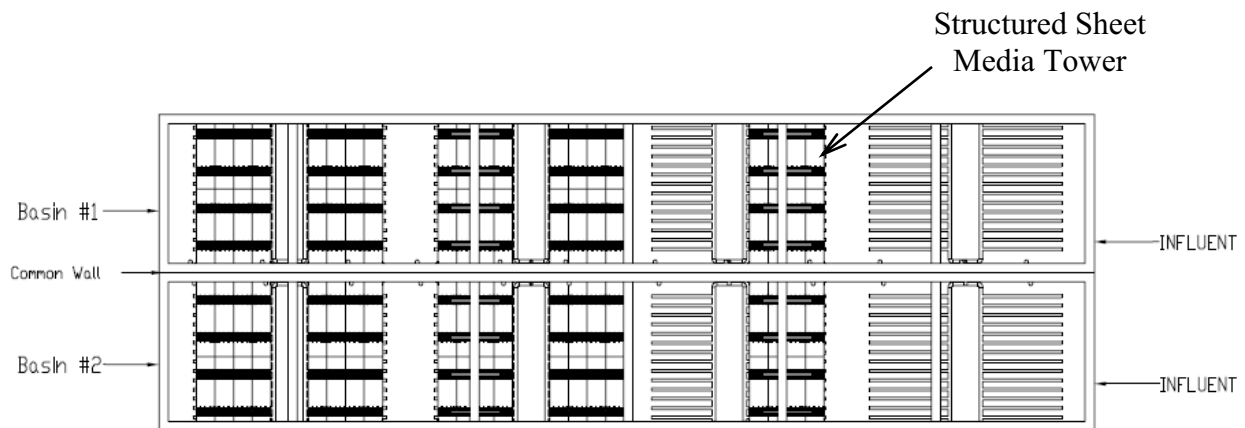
Hopedale, MA WWTP IFAS tower plan-view layout
